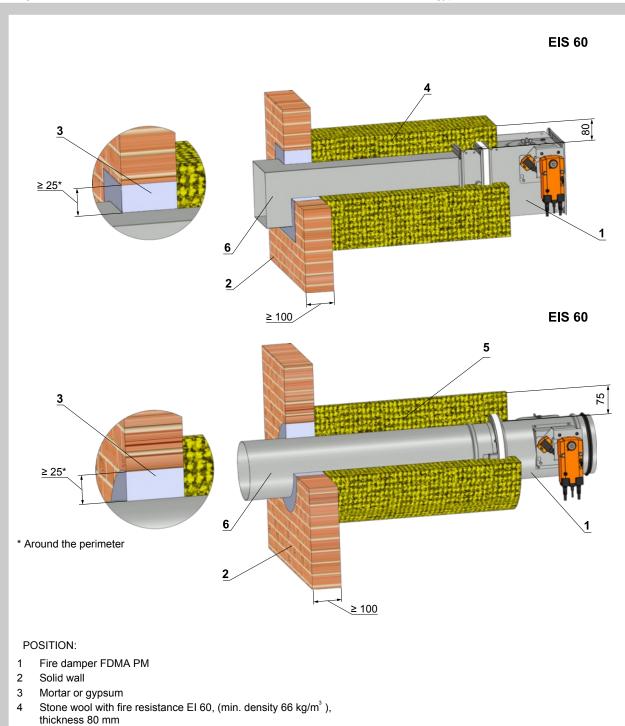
Installation outside of solid wall construction - mineral wool - mortar or gypsum
